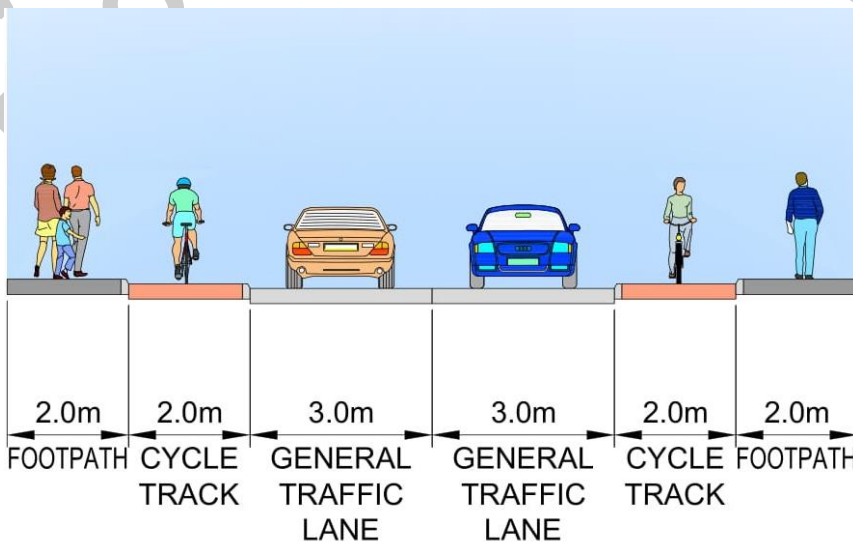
Section 2, Proposed Option 4a – Cross Section B-B
